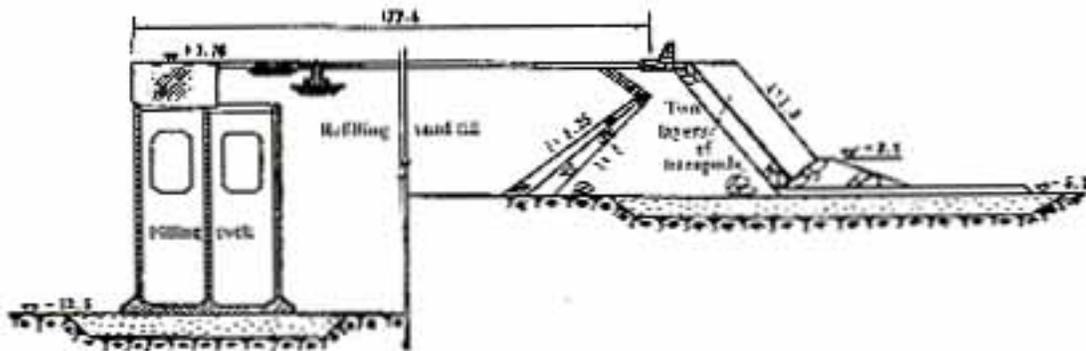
Cross section of pier at the Port of Qinhuangdao (in m).
